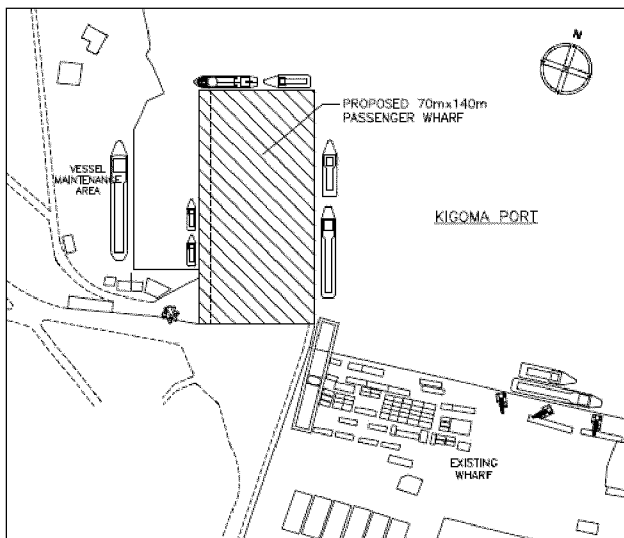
Location of Requested Facilities      Figure 1.1-2 Layout Plan of Requested Facilities
